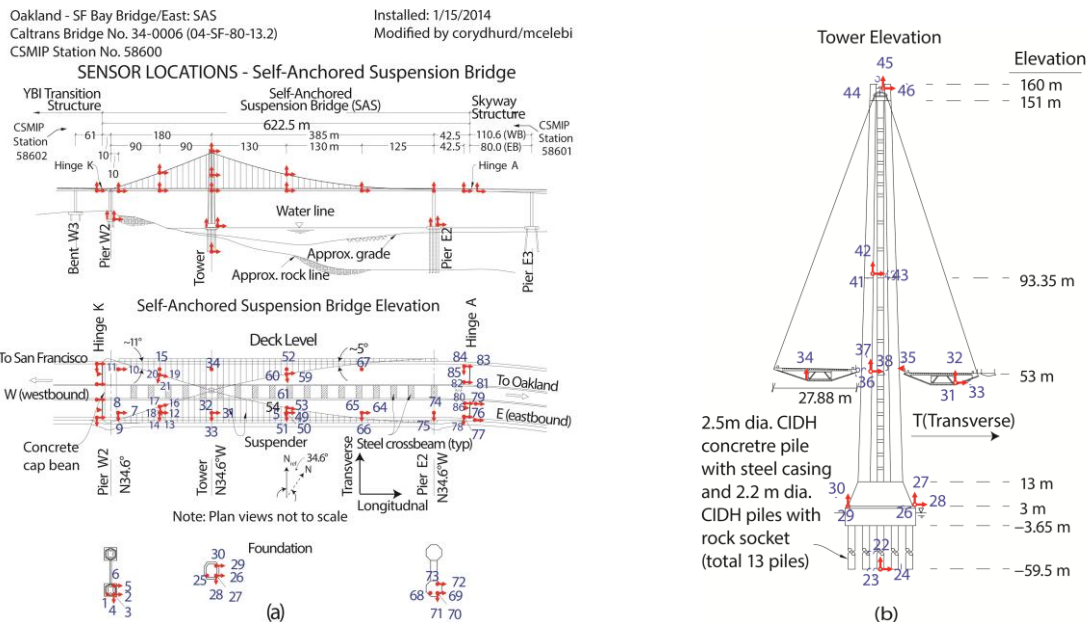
(a) Schematic showing vertical and plan views and some details of the foundation. The red arrows and dots refer to the location and orientation of the particular channel of accelerometer. (b) Vertical elevation of the tower and decks at the tower location. Figure modified from www.strongmotioncenter.org. CIDH pile refers to cast-in-drilled-hole pile.
